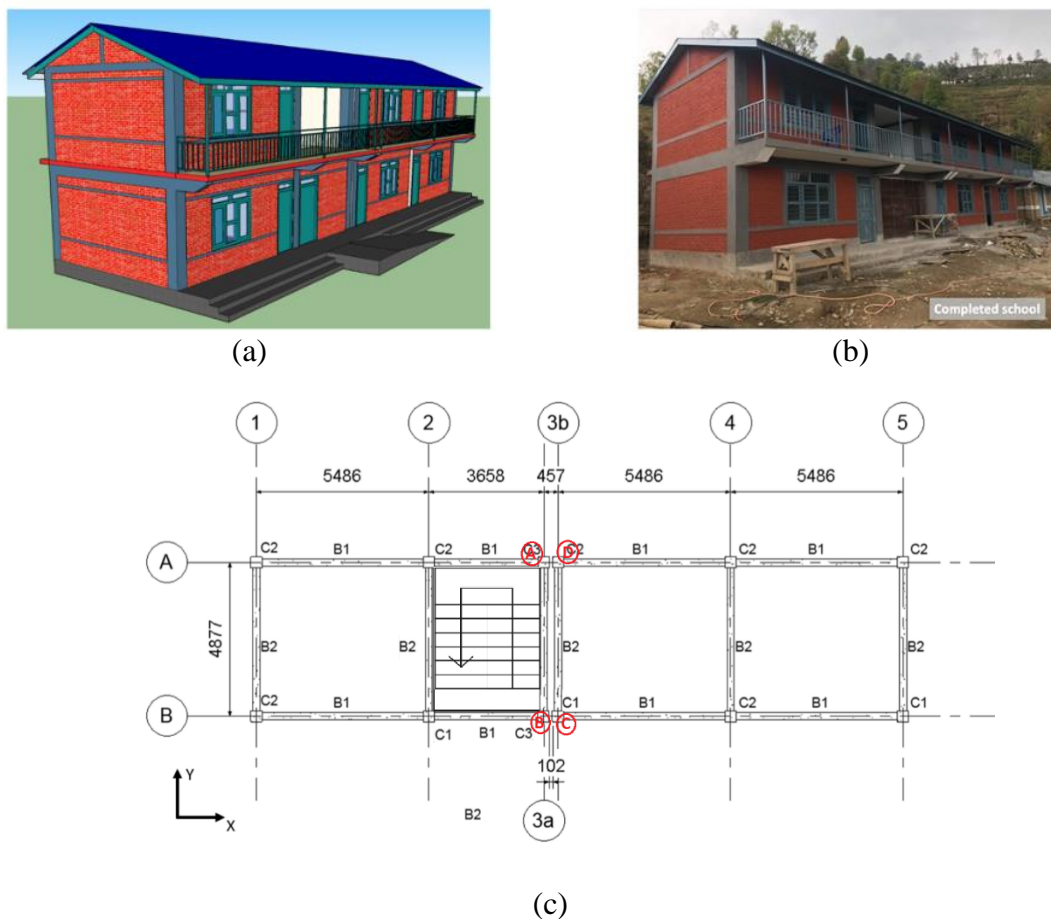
6 Pahar Trust template RC with infill school: (a) 3D architectural rendering; (b) example of a realised project; (c) beam and column layout of the template school (units in mm) (Pahar Trust, 2020).
